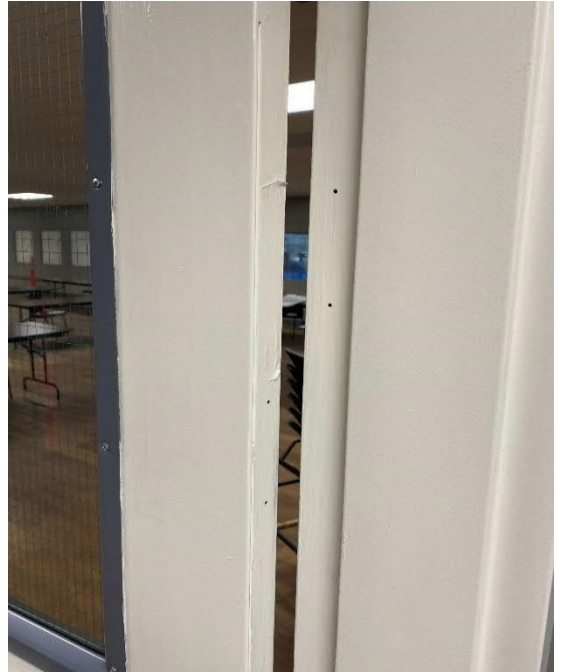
Door into Mezzanine from Elevator - Rating Missing
